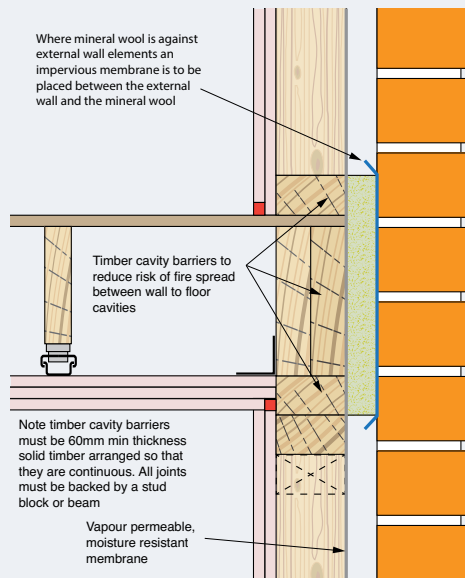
FRL 120/120/120 Fire-protected timber frame wall /floor junction with integral cavity barriers – beams perpendicular to wall
